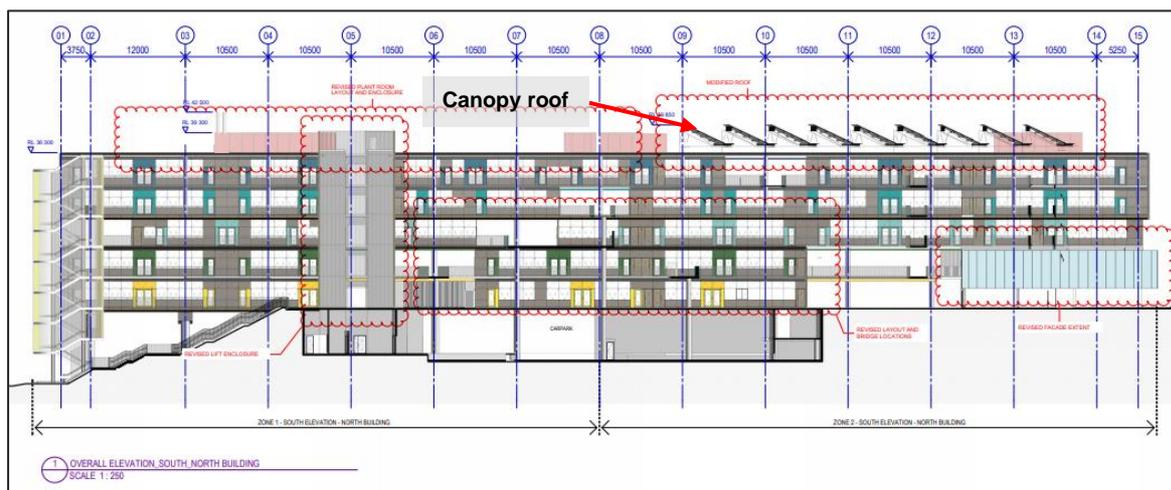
Canopy roof form as proposed to be modified (Source: Applicant's Modification Application 2020)
